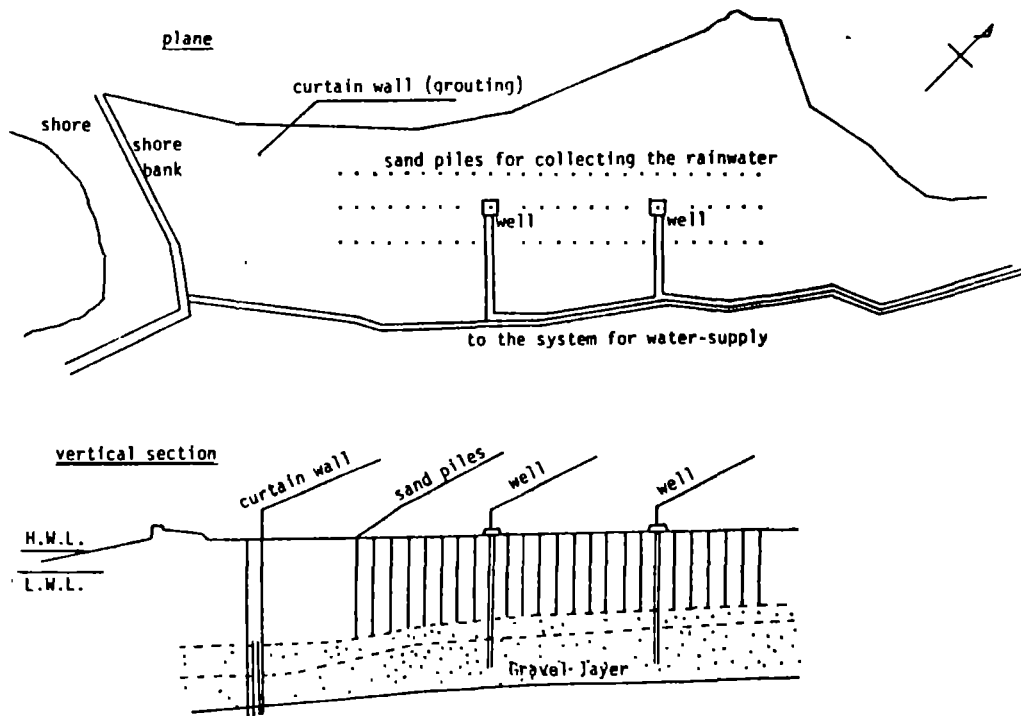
(c). Construction site plan and vertical section (Matsuo 1977).
